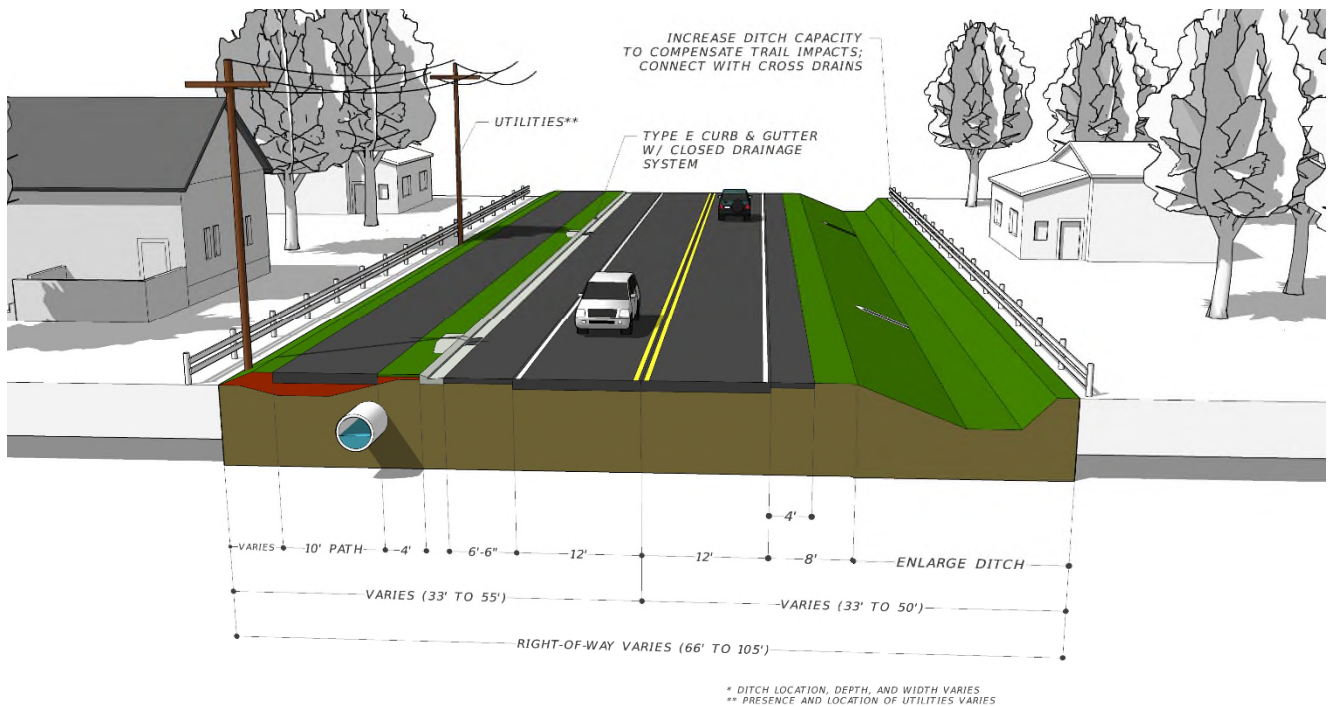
| Typical Section 4B – Very Constrained with Curb and Gutter
